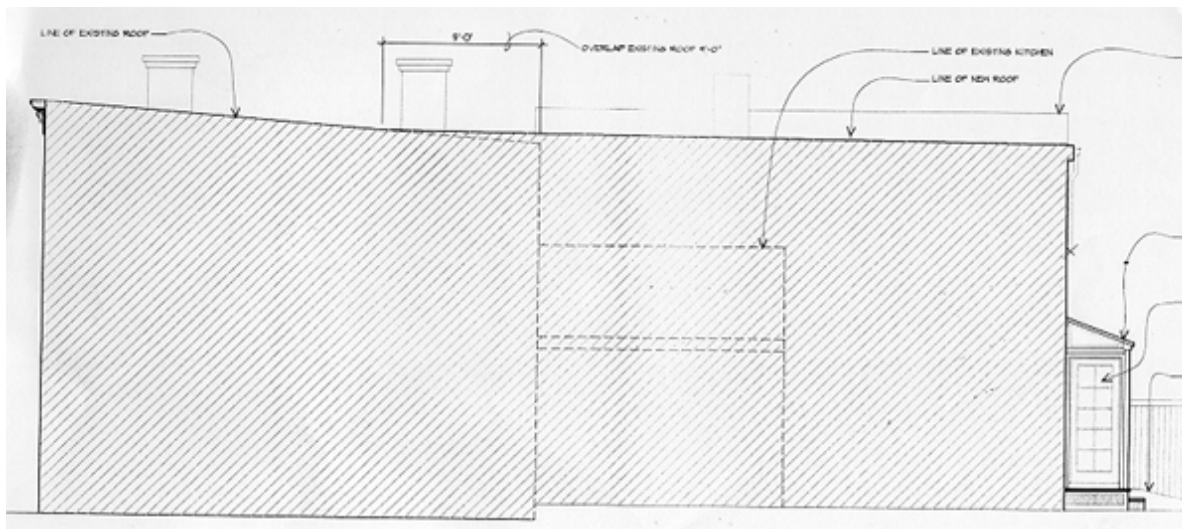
Revised North Side Elevation (dashed lines show existing structure)
